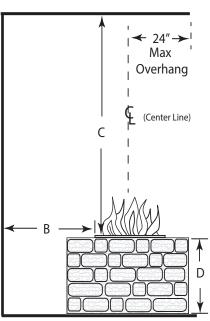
Fire Ring Dimensions; refer to Table 1.
